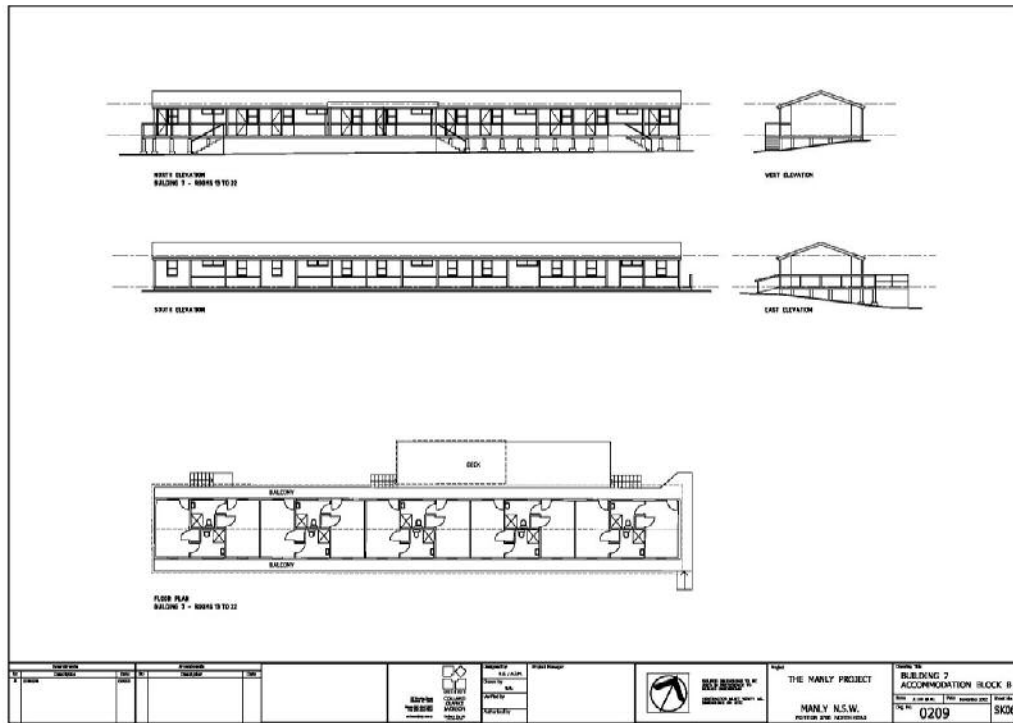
Drawing showing dormitory building. Collard Clarke Jackson Architects - March 2003.
